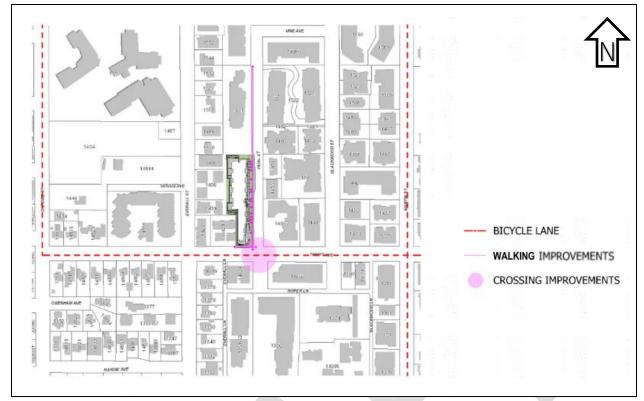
Walking Improvements Plan View of Pedestrian and Cycling Routes (Source: Keystone Architecture)
